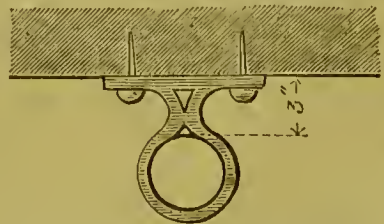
Section of Rain-water Pipe, showing it fixed three inches from Wall.
